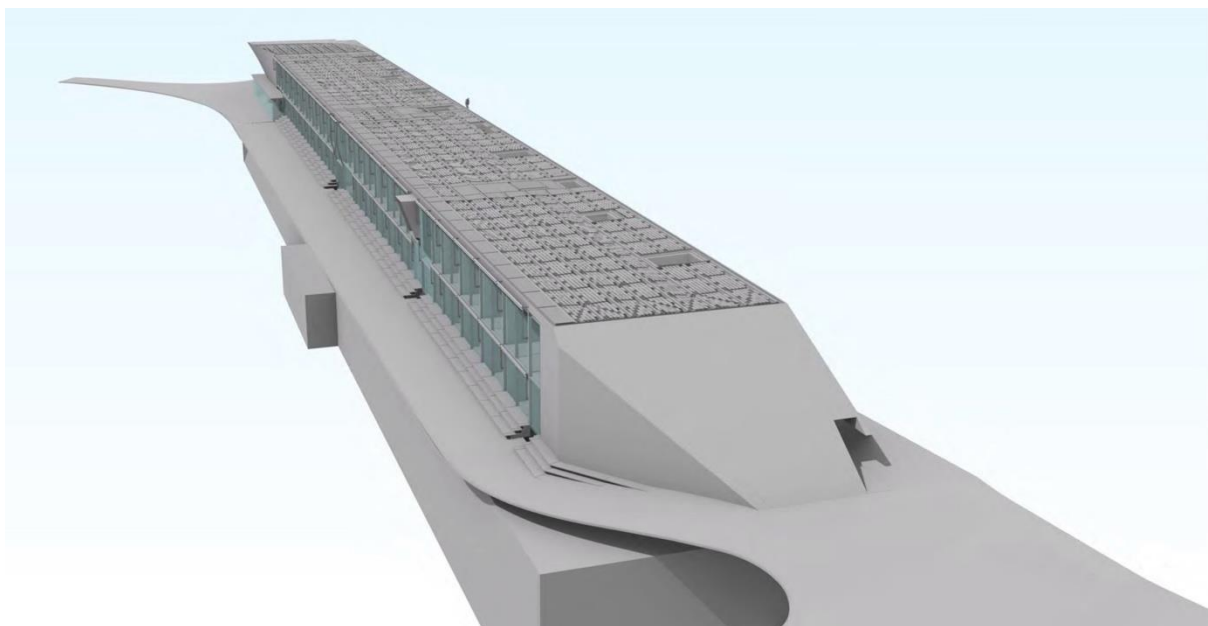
3-D presentation of the current design proposal for the new hotel annex building, seen from the east (Wolfgang Tschapeller Architekten)
